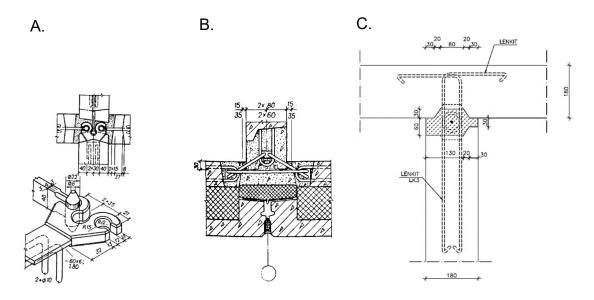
A. "Chigik-lovitel"; B. Loop connections with steel braces (15, p. 24,27); C. Loop connections with vertical rebar (8)
